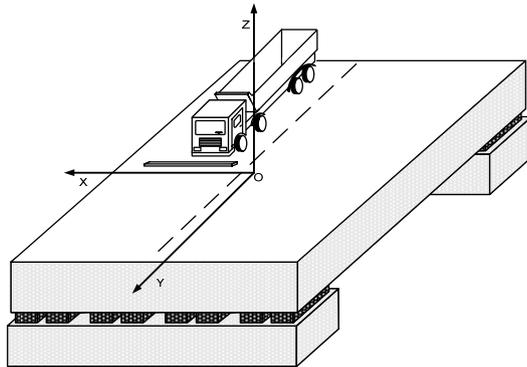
A sketch section of the bridge, a passing truck over an obstacle.
